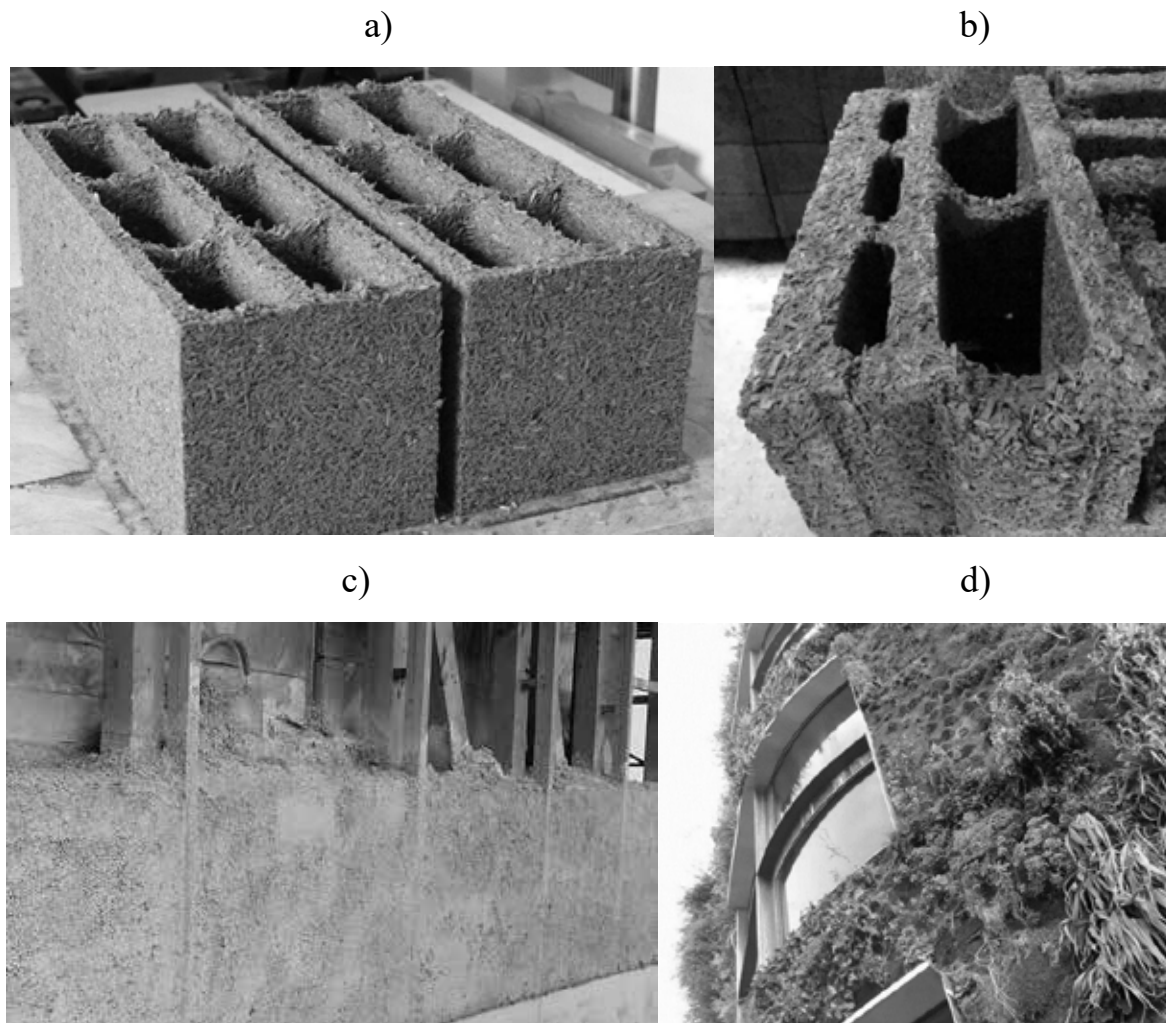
Examples of bioconcrete application: a) symmetrical blocks; b) asymmetrical blocks; c) insulation; d) eco-building
